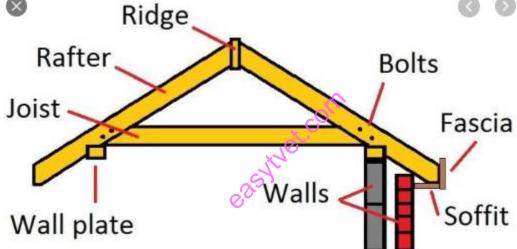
Erect building roof according to standard construction procedures Source: Carpentry tips and tricks
